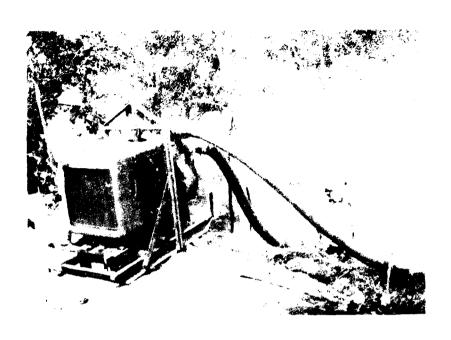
Water pump used for dewatering pond (June 6, 1984)
